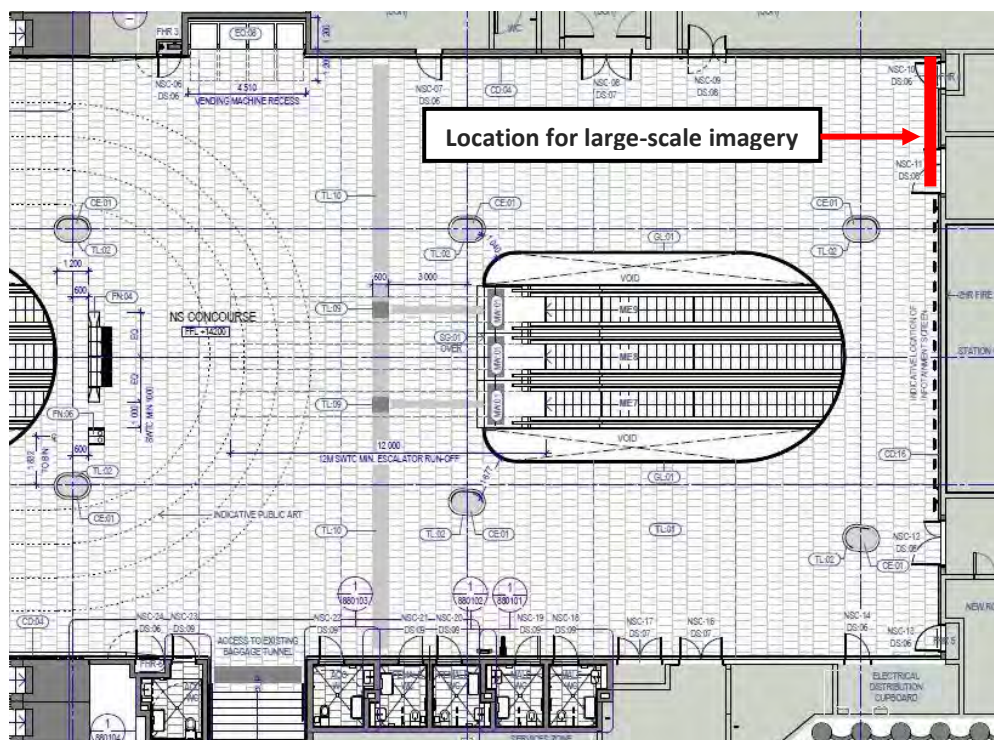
PARTIAL PLAN SHOWING THE SOUTHERN END OF THE NORTH-SOUTH CONCOURSE AND LOCATION FOR LARGE-SCALE IMAGERY. SOURCE: ARCHITECTURAL DRAWING BY WOODS BAGOT AND JOHN McASLAN + PARTNERS (NS CONCOURSE FLOOR PLAN SMCSWSCM-WBA-BC-20-DWG-AT-326003, REV. D 19.09.19)
